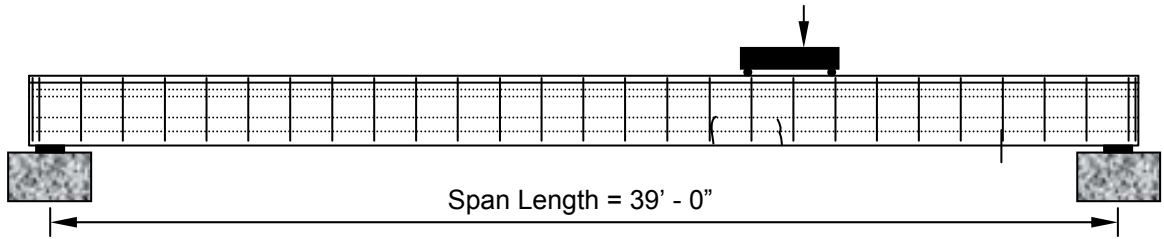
Crack Pattern at Cracking Load for SCC-MS-1W
